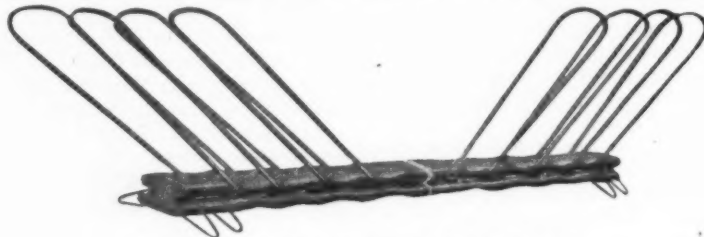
NEW REINFORCEMENT FOR CONCRETE.
